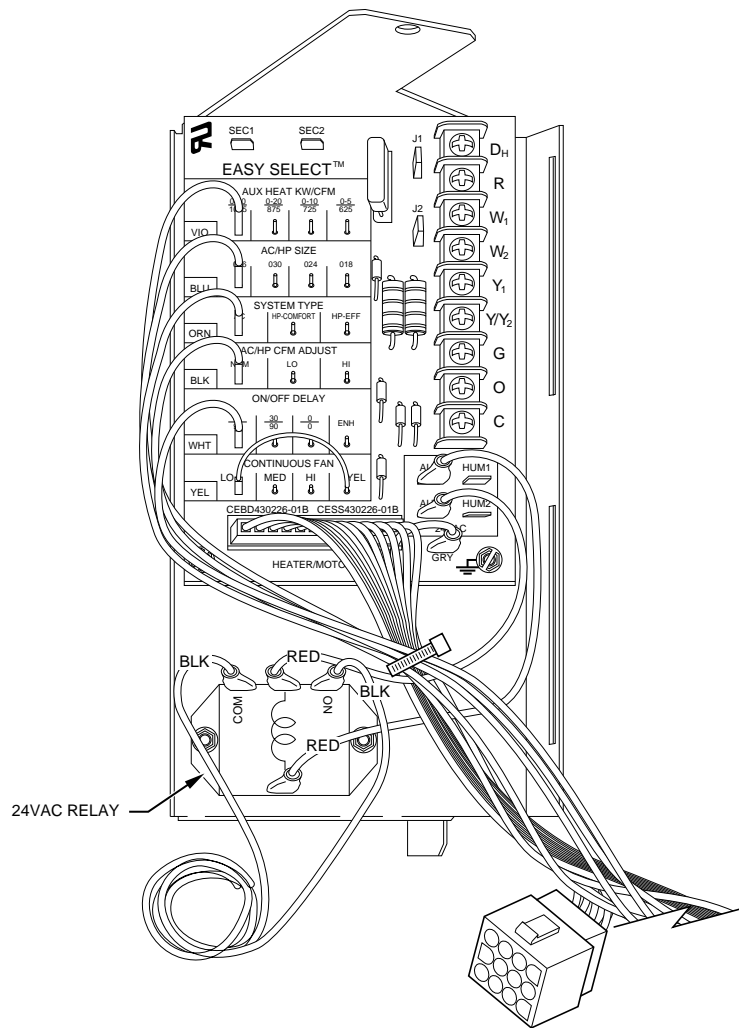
Accessory Air Cleaner Relay Mounted on PCB Bracket
